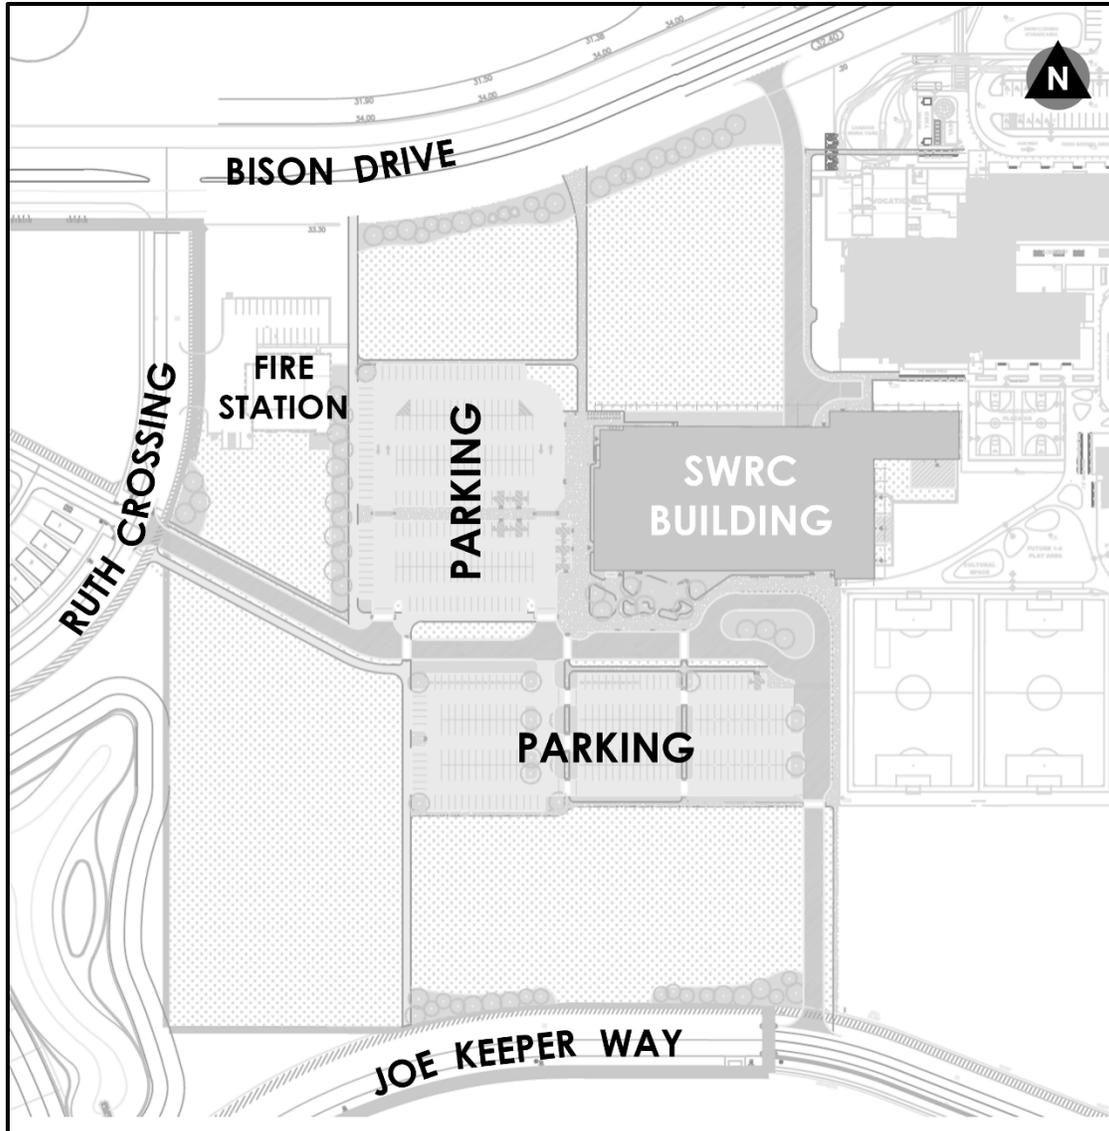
SWRC SCHEMATIC SITE PLAN
